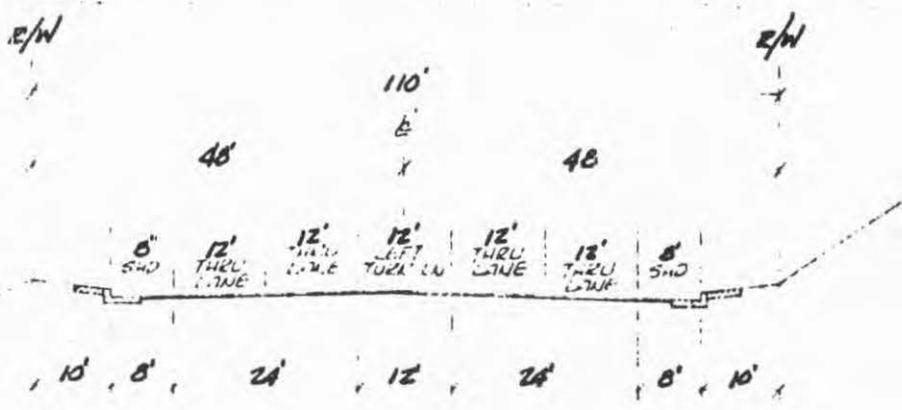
STREET STANDARDS, CROSS-SECTIONS
